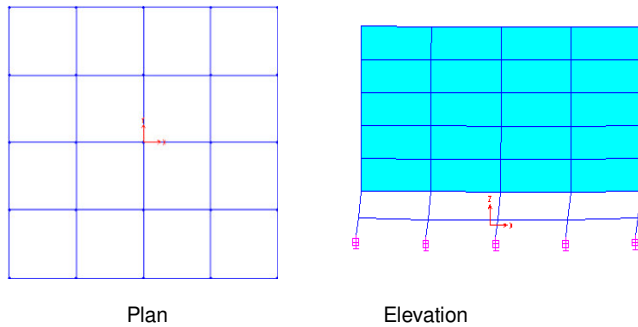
Plan and elevation of modeled building with soft bottom storey.
